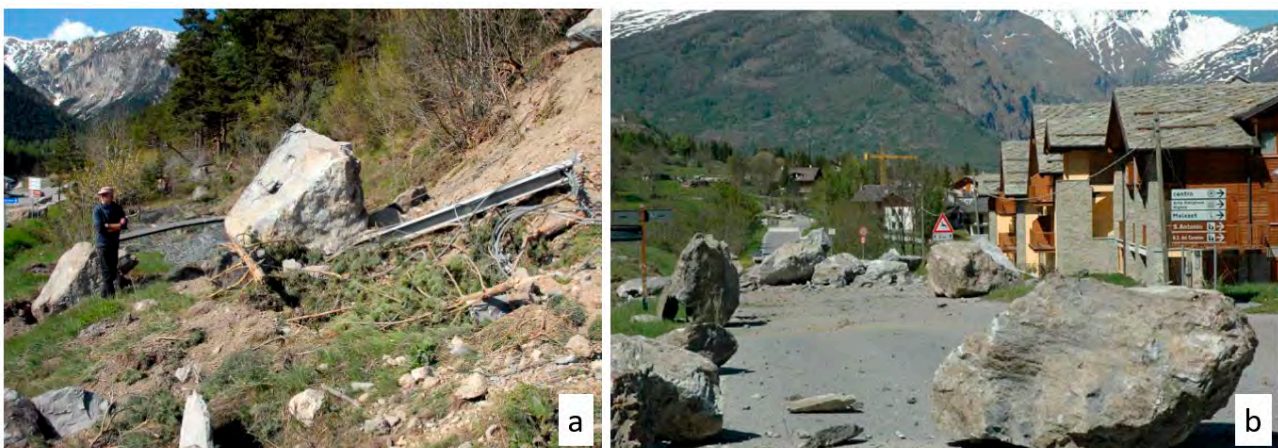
Some of the blocks that detached from the slope during the 2010 event and caused damage to the existing rockfall barriers (a) and the SP 216 road (b) [18].
